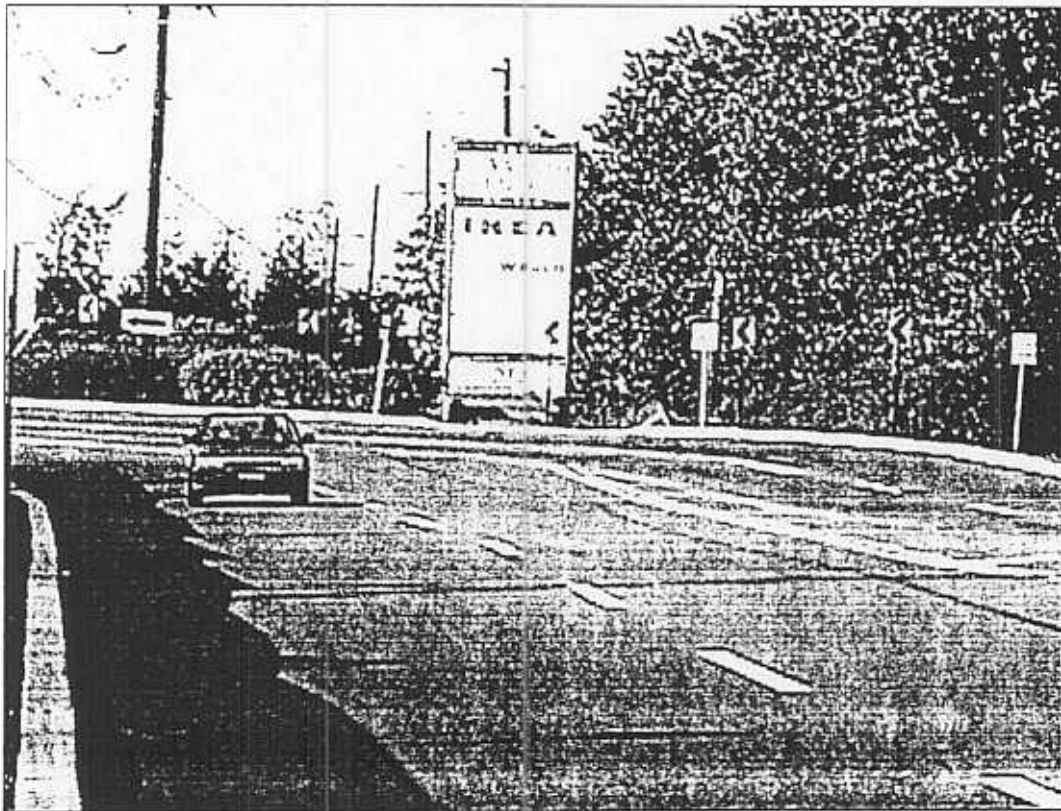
Ash-Modified Pavement Section Facing North on Center Drive
